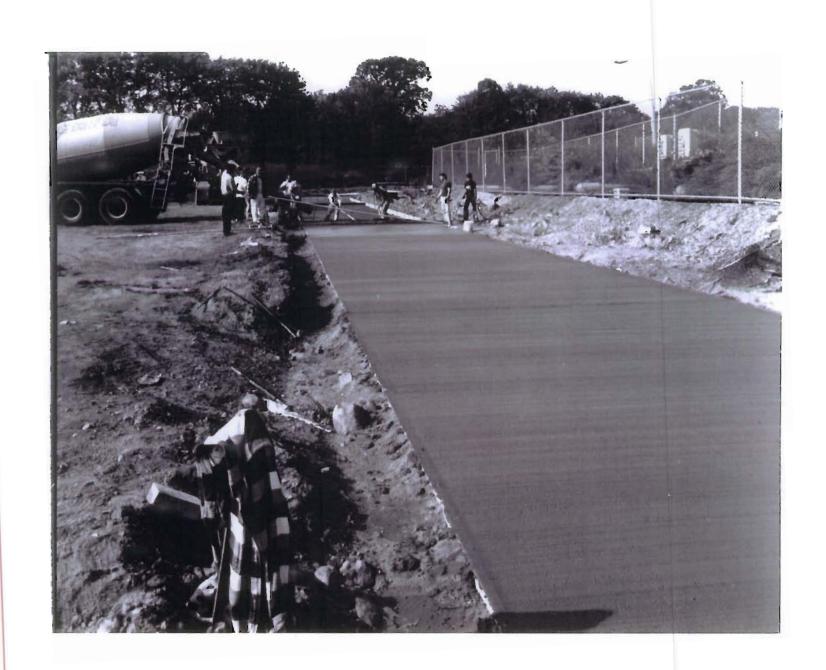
Construction of Concrete Slurry Wall Cap. (October 14, 1994)
